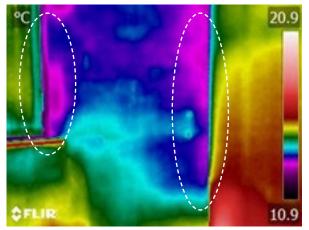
IR image showing window reveal and external wall to partition wall junction next to Office 5
